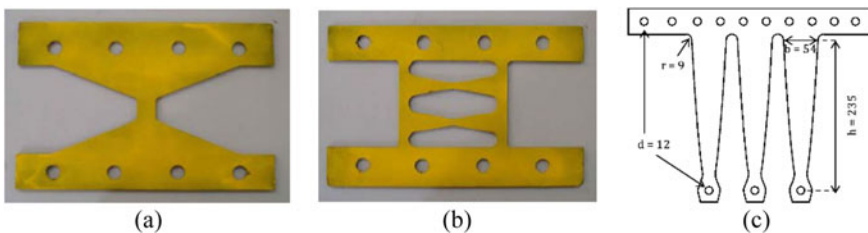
Metallic yield dampers a X-shaped [28], b Double X-shaped [28], c Comb Teeth Damper [29]
